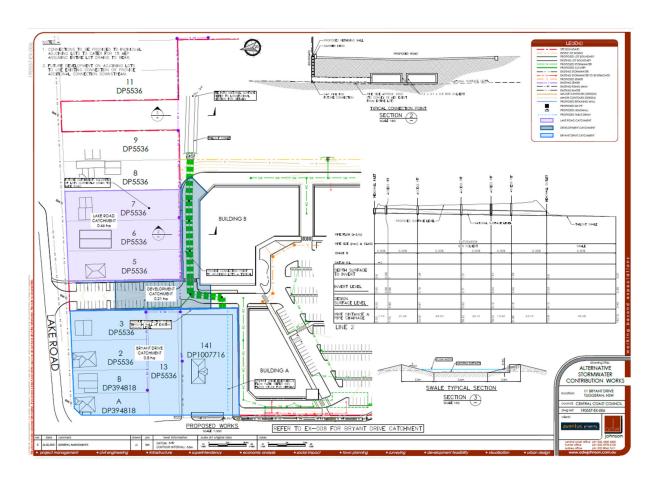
Plan showing drainage strategy proposed by applicant (variation to the contributions plan)
